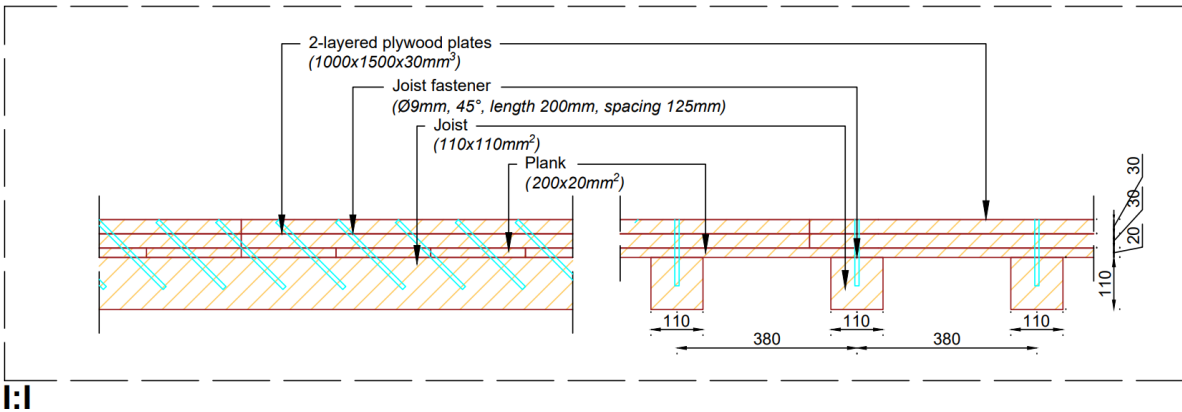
Detail I:I of Figure 7.14, strengthened joist
